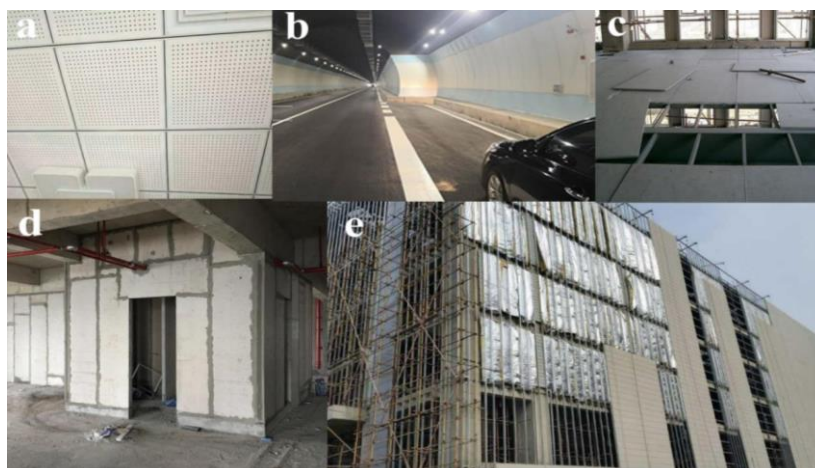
Widely used calcium silicate board: (a) ceiling board; (b) fireproof decorative board; (c) floor board; (d) partition board; (e) exterior wall board [17]
